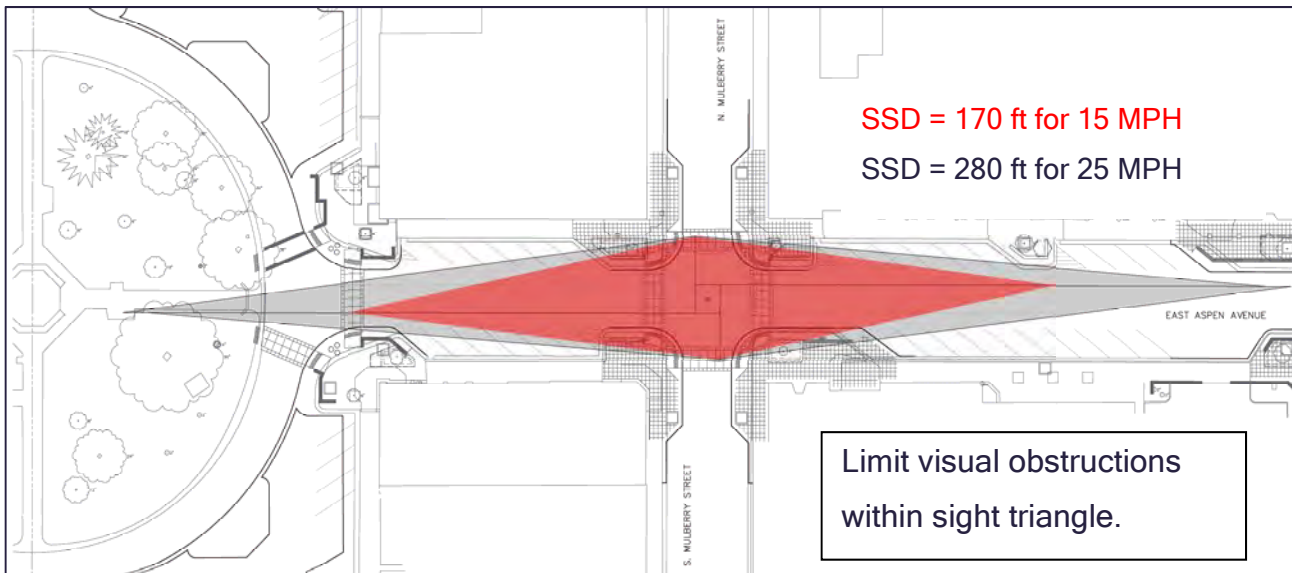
Aspen Avenue at Mulberry Street Sight Distance
